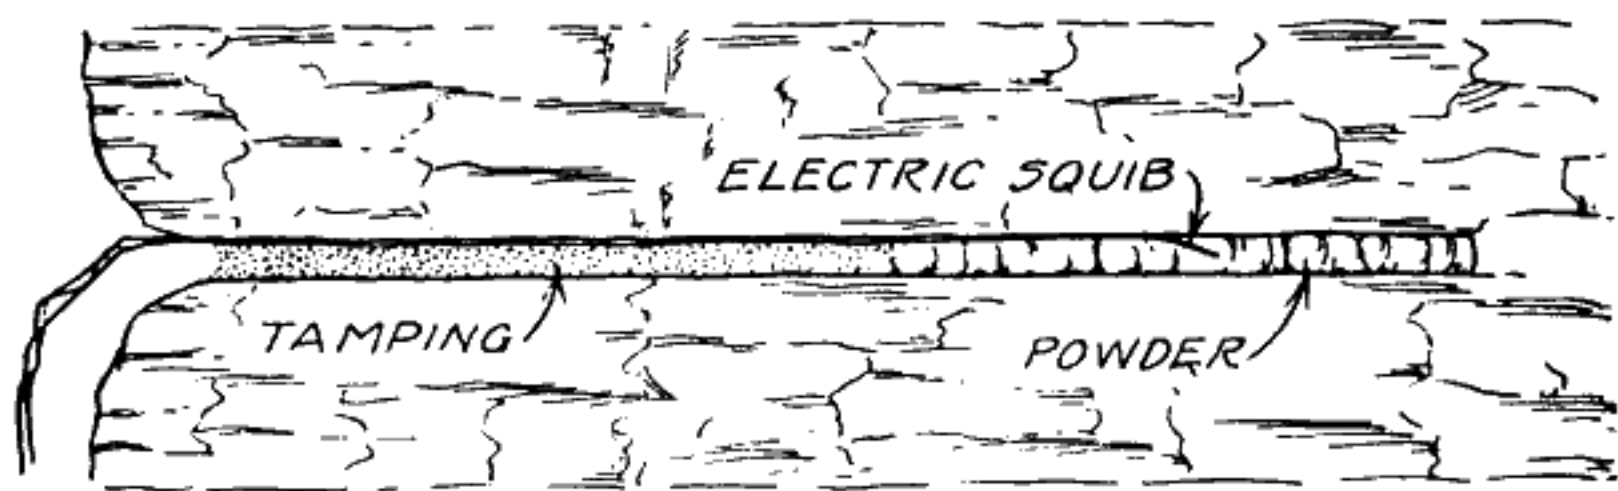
Bore hole charged with three cartridges or tamping bags, middle one primed with Electric Squib. Note how completely bore hole is closed and how the charge is ignited from the center.
